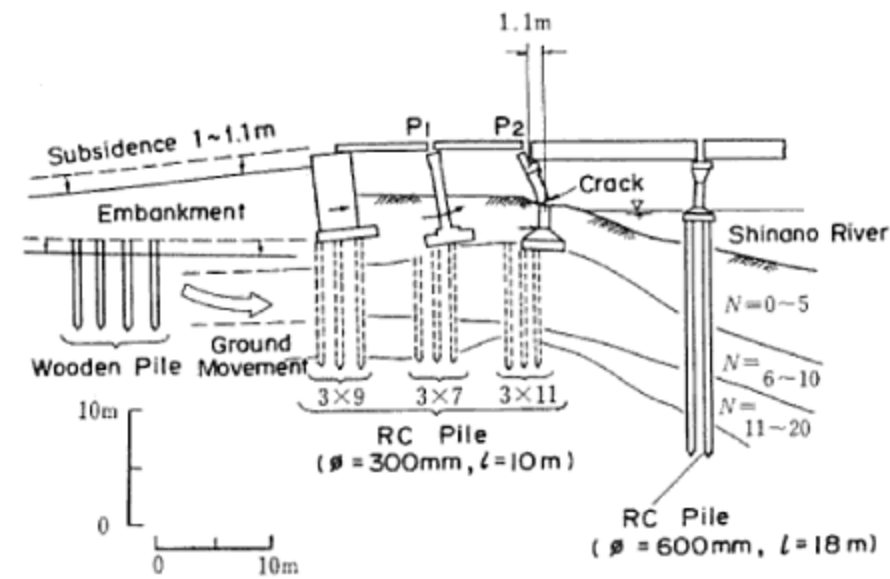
Damage to the abutments and piers of Yachiyo Bridge (Hamada and O'Rourke 1992)
